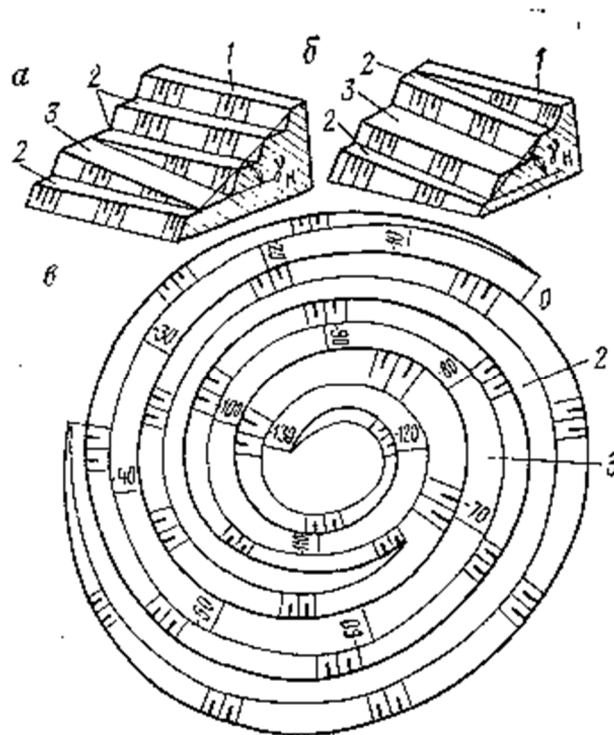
Schemes of boards with horizontal and inclined safety berms:
